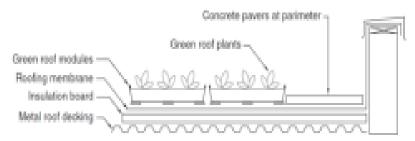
Typical Cross Section Modular Green Roof *Source:* Luckett, K. 2009.
